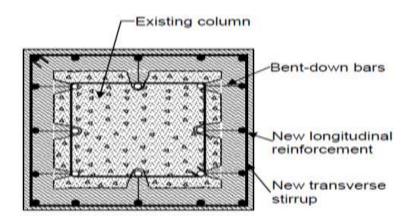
Cross section of concrete jacketing (Durgesh, 2004)
